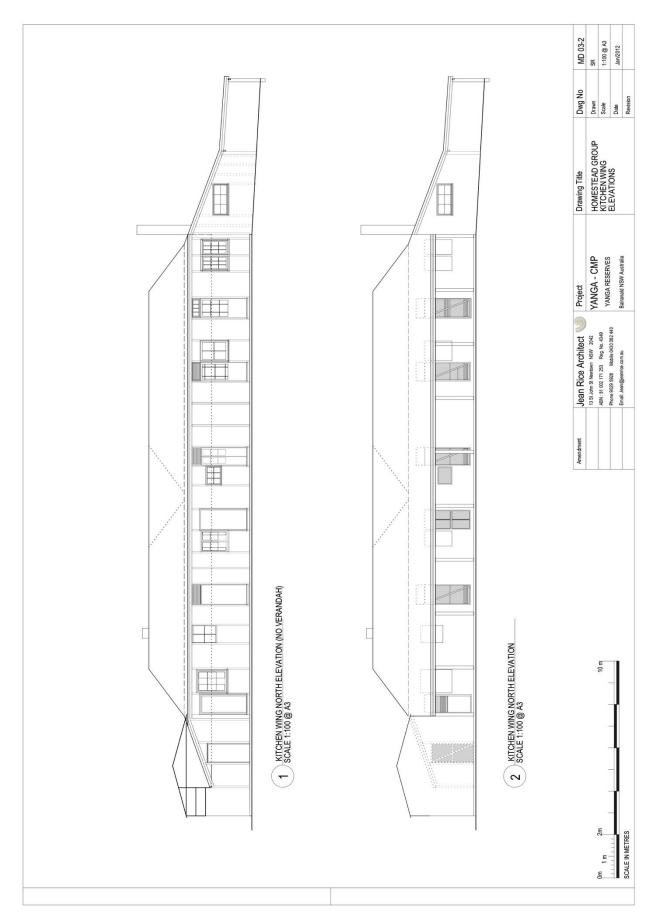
Homestead Group Kitchen Wing Elevations. Jean Rice Architect, site assessment 2009.
